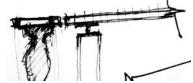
Conceptual detail of extension of stage floor area over orchestra pit
